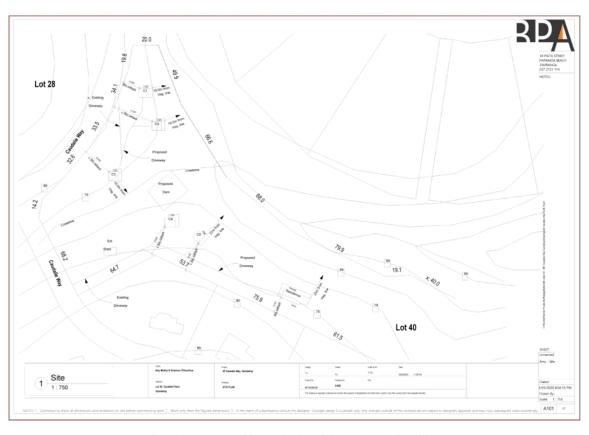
Proposed Layout for Lot 40 Caudalie Way, Quindalup
